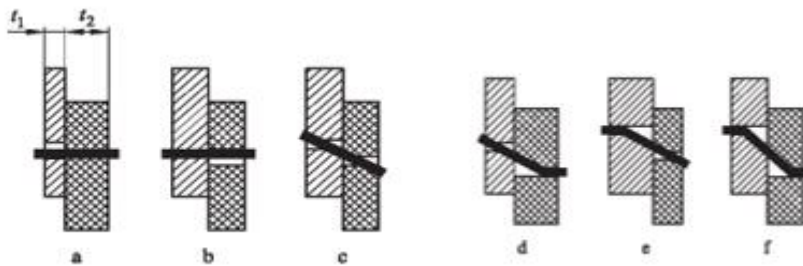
Failure modes for timber and panel connections (Norges Standardiseringsforbund, 1995)
